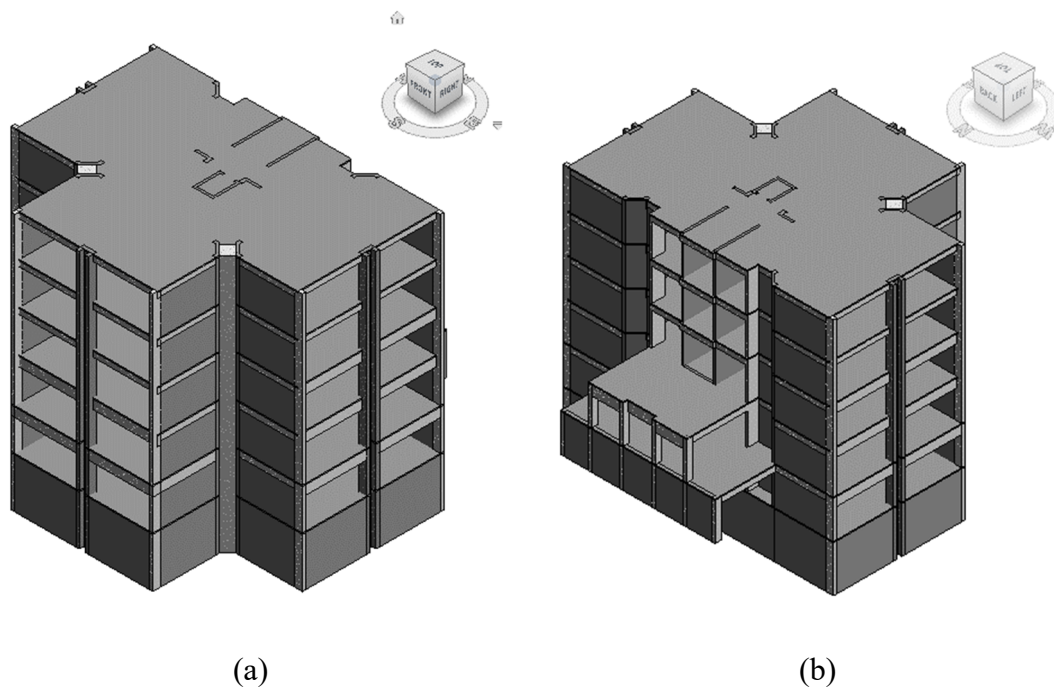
Views of the structural system of the post-retrofit building from the (a) SE and (b) NW corners.
